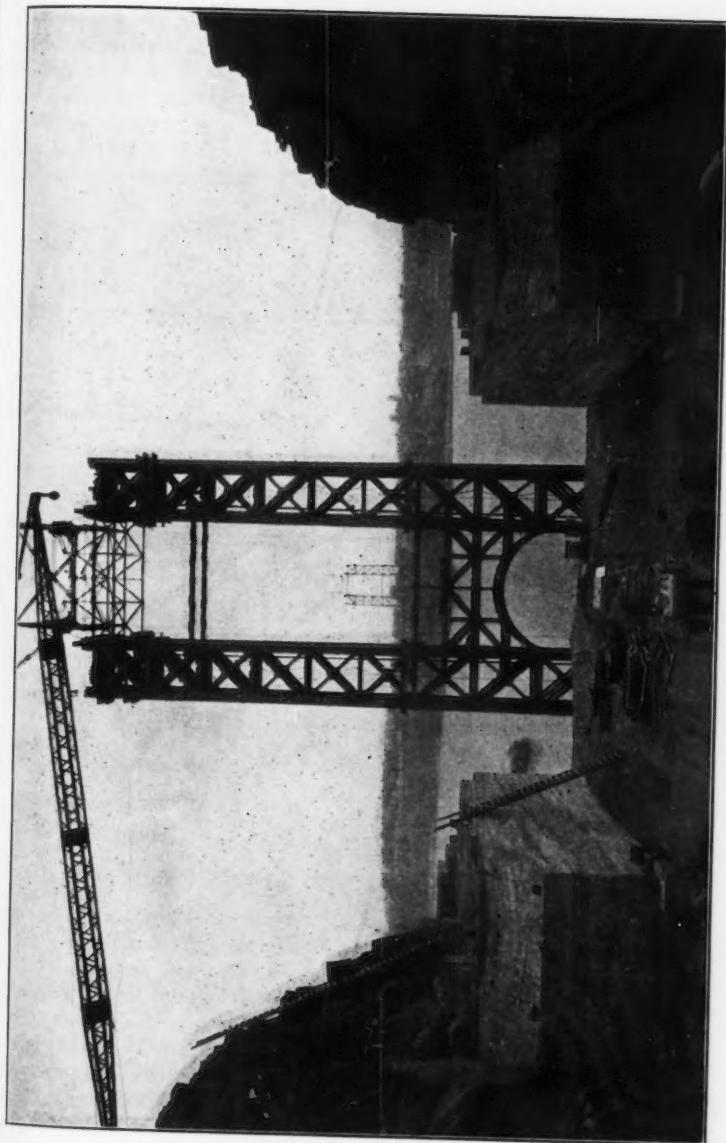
NEW JERSEY ANCHORAGE BLOCKS IN OPEN CUT.
